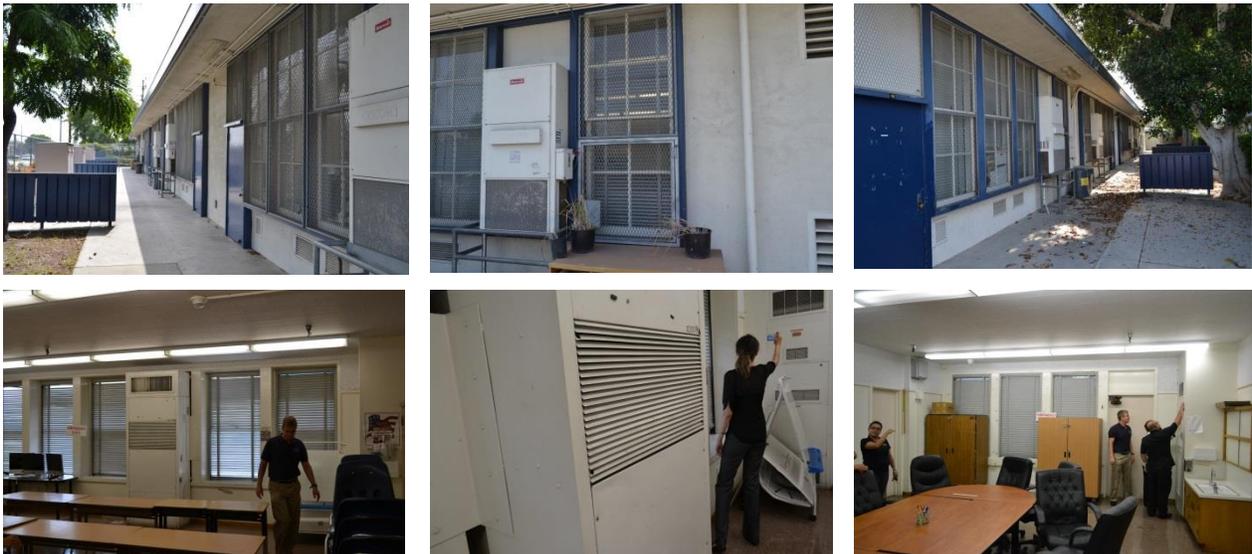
Hawaiian Avenue School Study Area & Building Configurations
